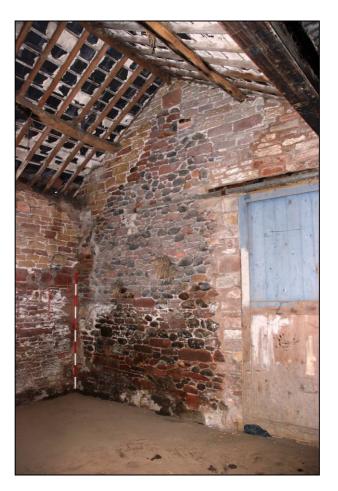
west wall of main barn; note former gable and heightened wall above, and extensive rebuilding around inserted door. Note also burning to purlin.
